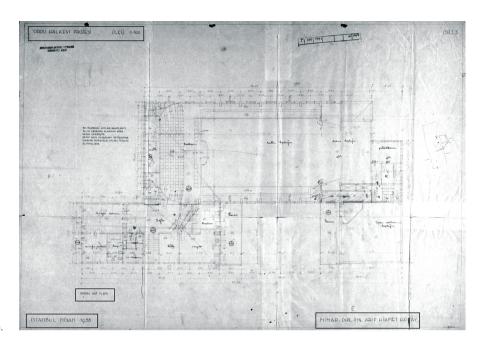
1/100 first floor plan for Ordu People's House (BCA, 490-1-0-0-1772-1191-1).
